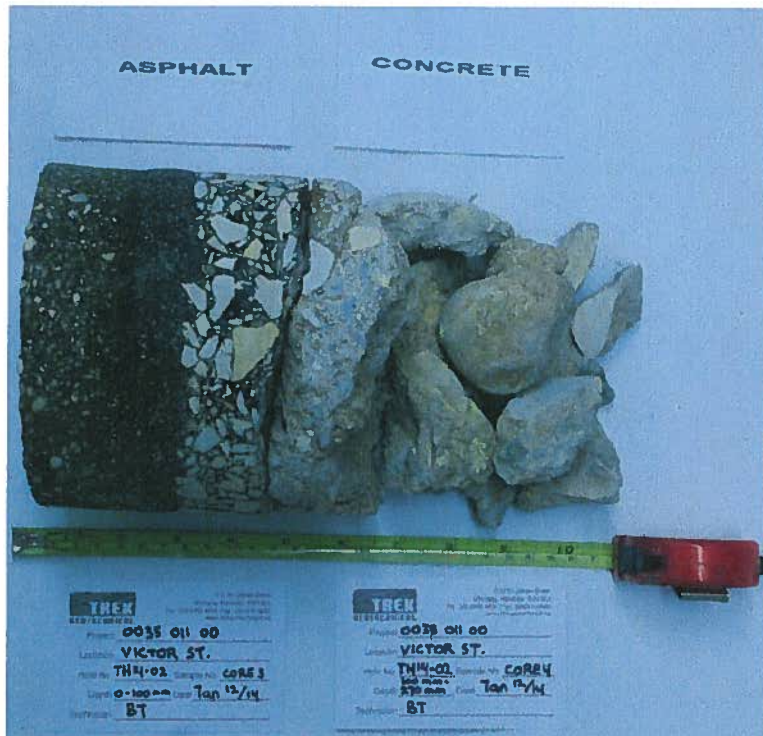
Asphalt and Concrete Core Sample from Test Hole TH14-02
